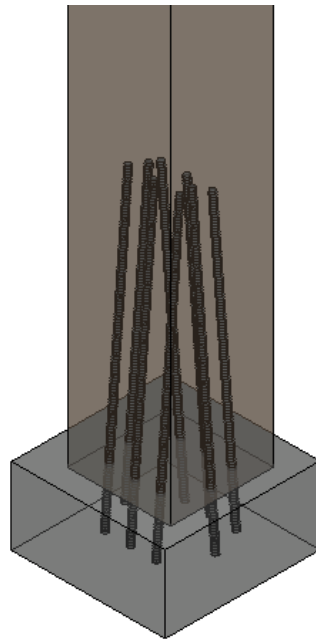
Attaching column to foundation by the use of steel rods only.
